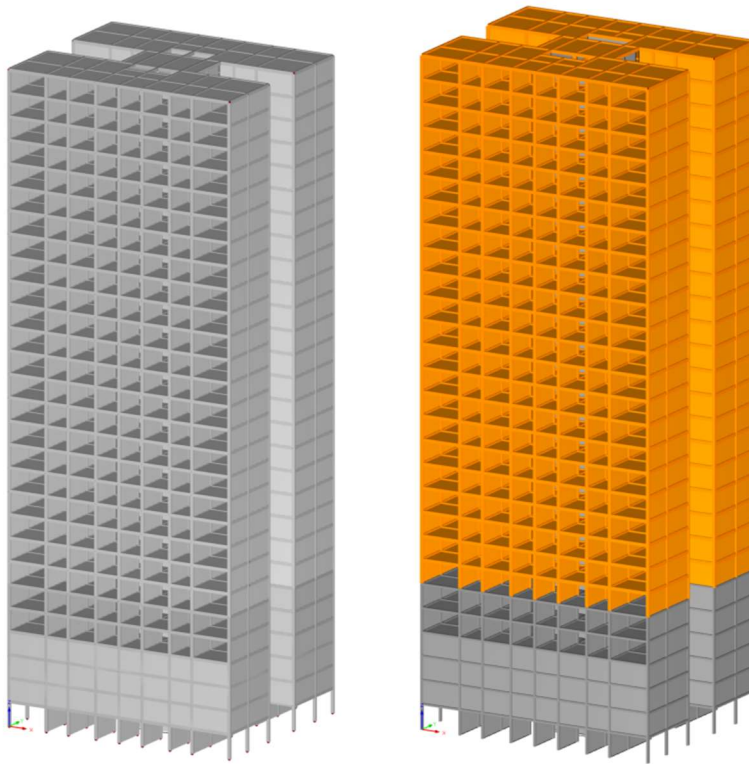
Existing-concrete (left) and Timber-concrete building(right)
